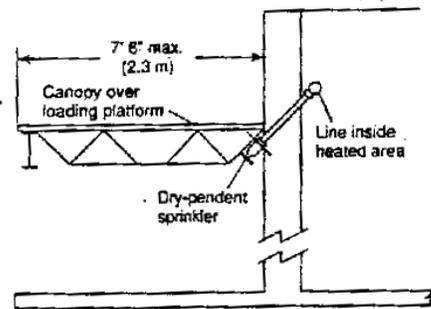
Dry-pendent sprinklers for protection of covered platforms, loading docks, and similar areas.
